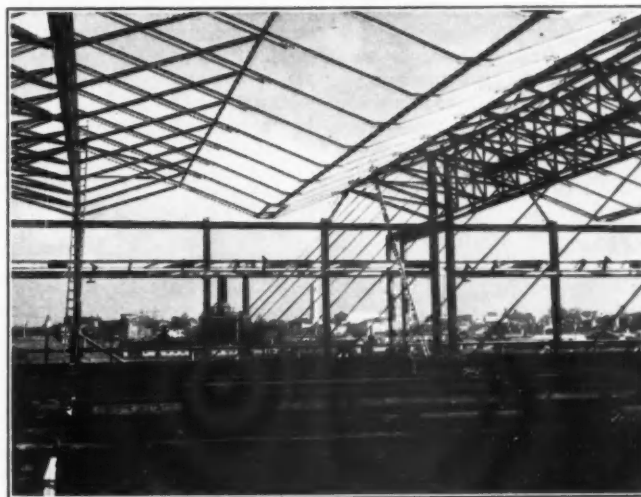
Roof steelwork showing torsion box and valley slings—also wires supporting deflection test loads.
